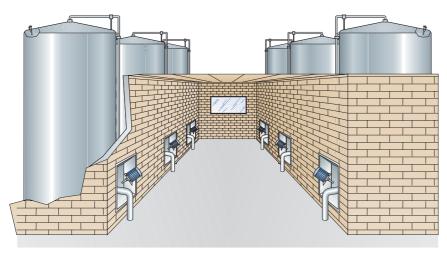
Layout of outdoor silo tanks with their manholes in alcoves in the walls of a covered control station.
